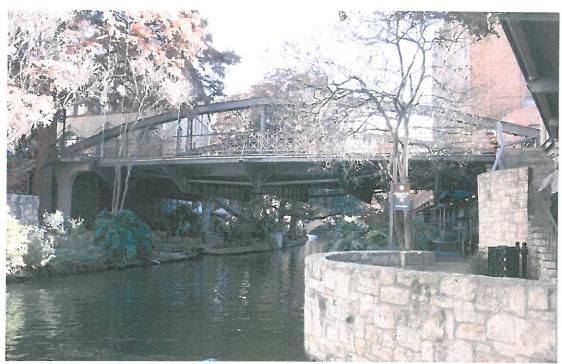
Northern Elevation of Crockett Bridge (Looking South)
